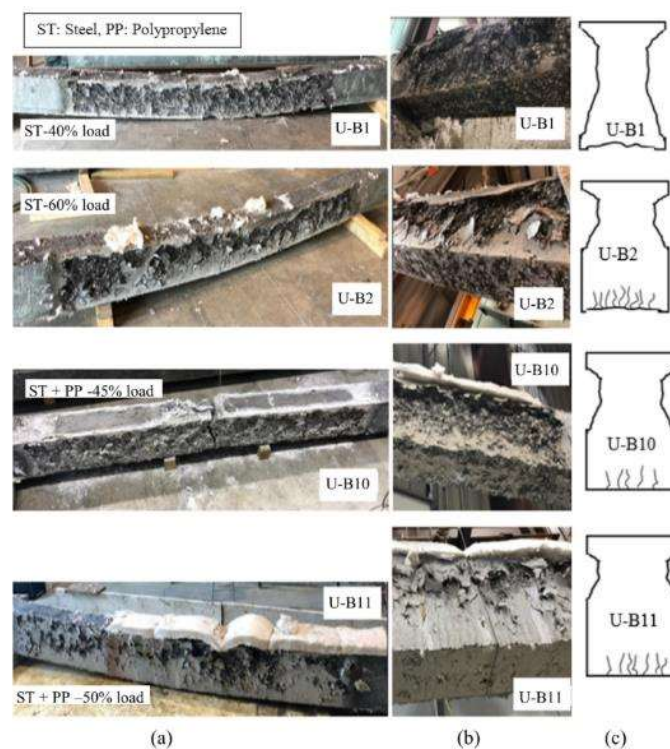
Fire test results: (a) state of UHPFRC beams after fire tests, (b) bottom surface in tested beams, (c) schematic illustration of spalling and cracking pattern in tested beams (169).
